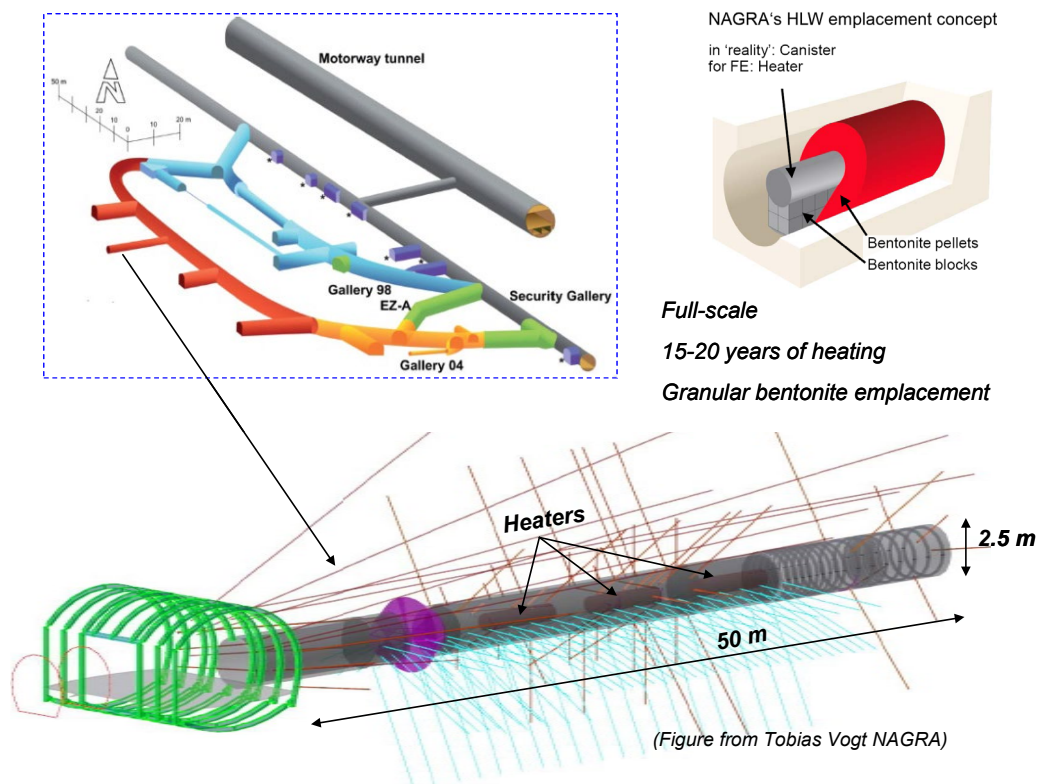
Plan view of FE experiment setup and borehole layout.
